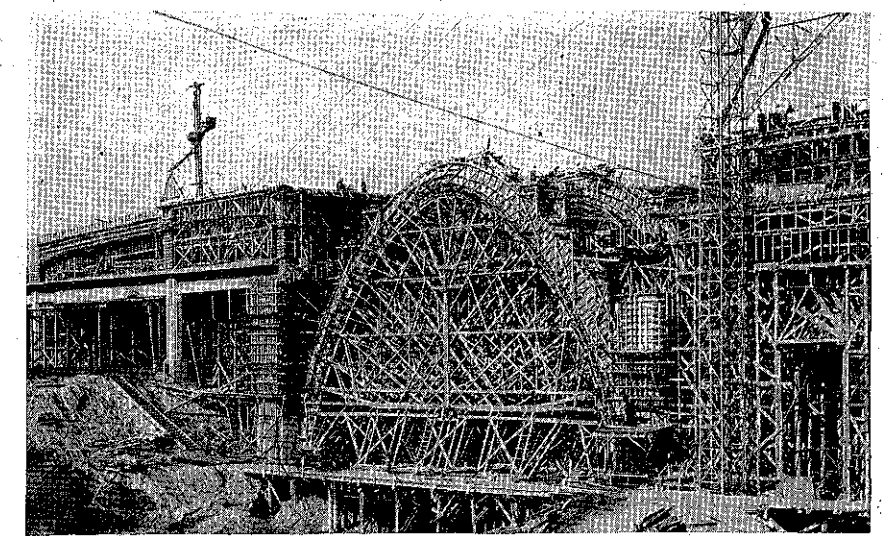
Mill Creek arch of 109-ft. span was poured in wood forms supported by an elaborate system of timber falsework.
